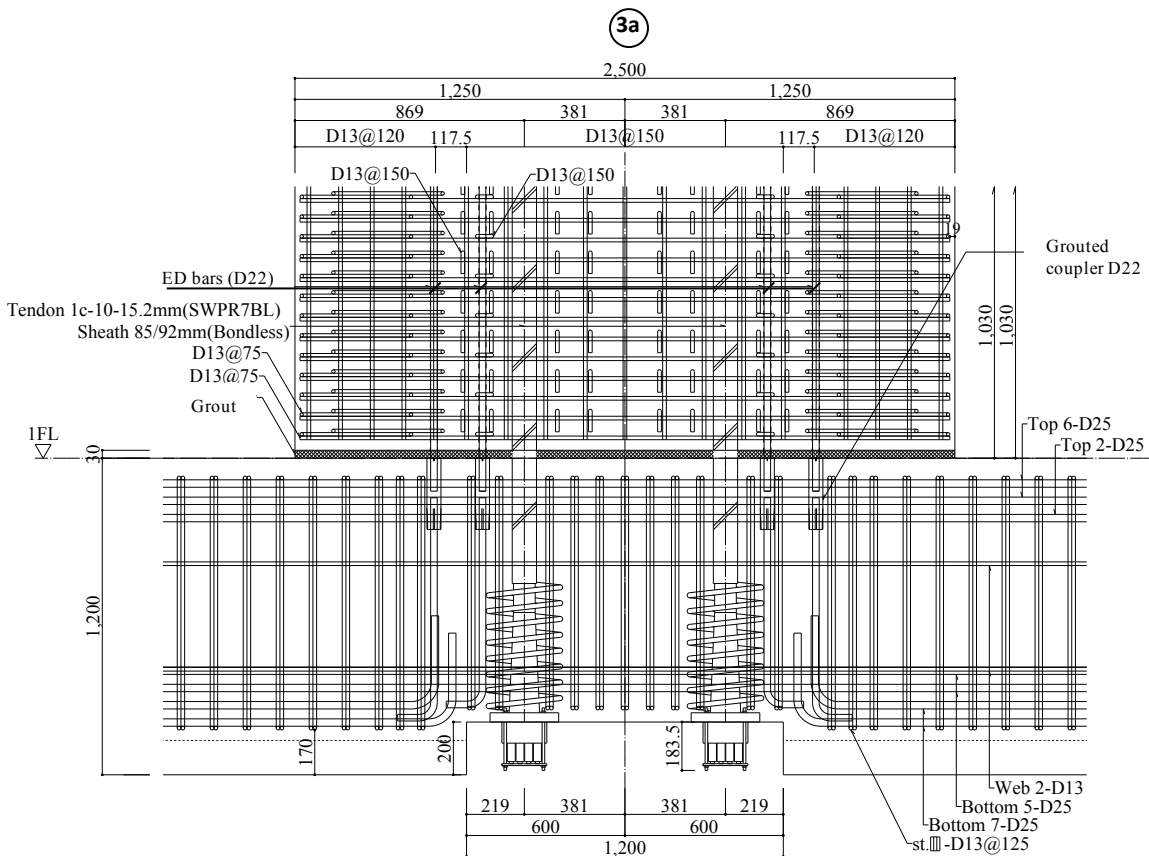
Wall-to-foundation connection detail (dimensions in mm) from Nagae et al. 2011
